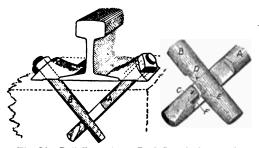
Rail Fastenings; Bush Interlocking Bolts.
